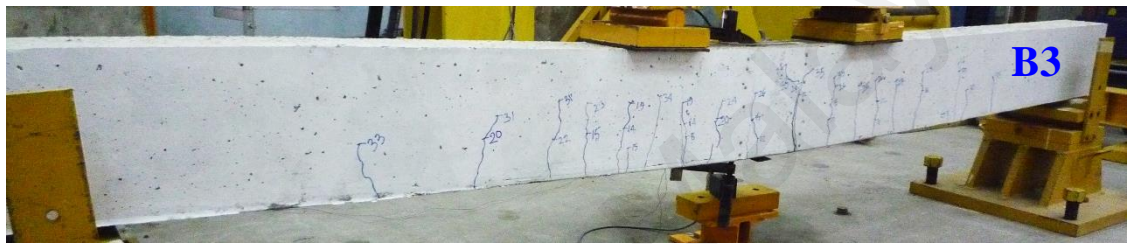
Typical flexural failure of the Beam specimen (B1 to B6)
